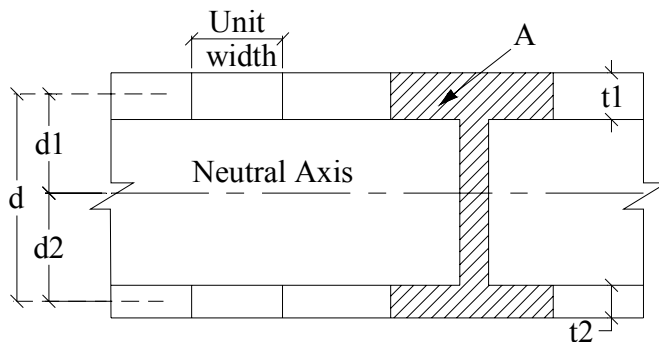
Longitudinal Section of Box-Girder Deck,
